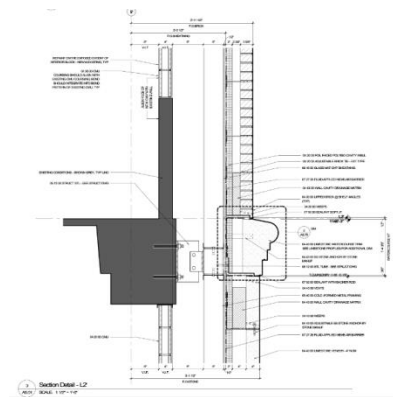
Typical Wall Detail (Courtesy of BCJ)
